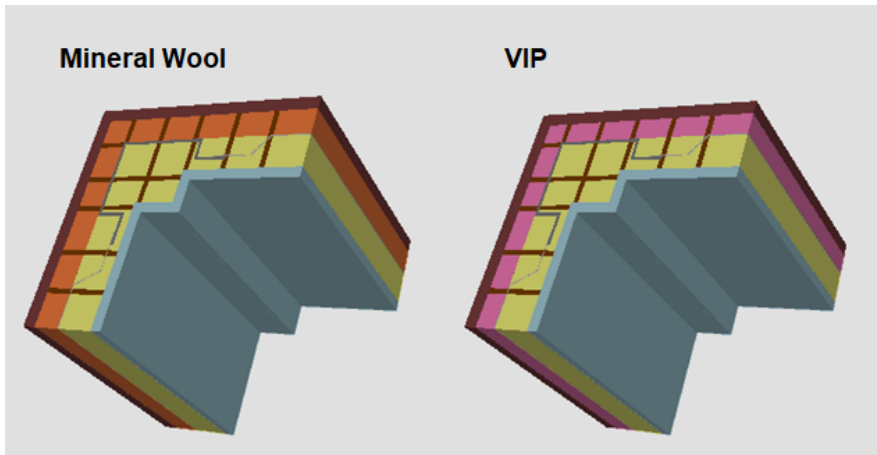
3D AnTherm improved externally insulated wall-wall corner construction views
